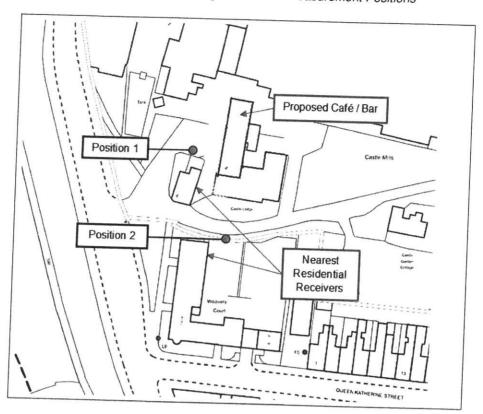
Site Layout Plan and Background Noise Measurement Positions
